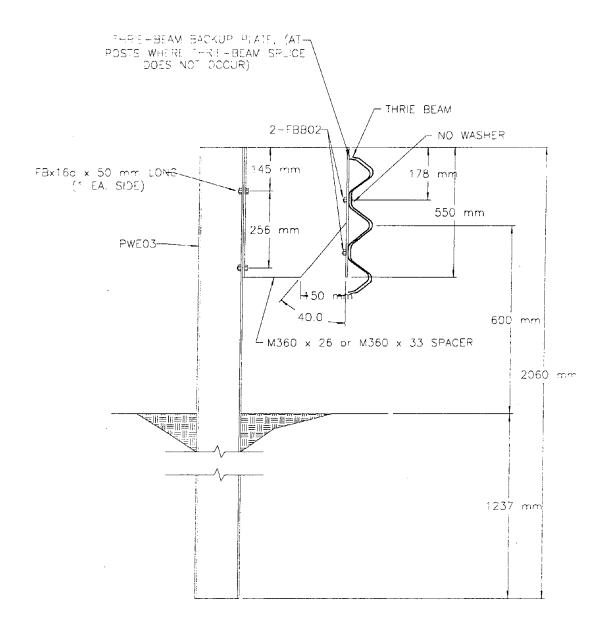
Cross-section of the thrie-beam (G9) guardrail system.
